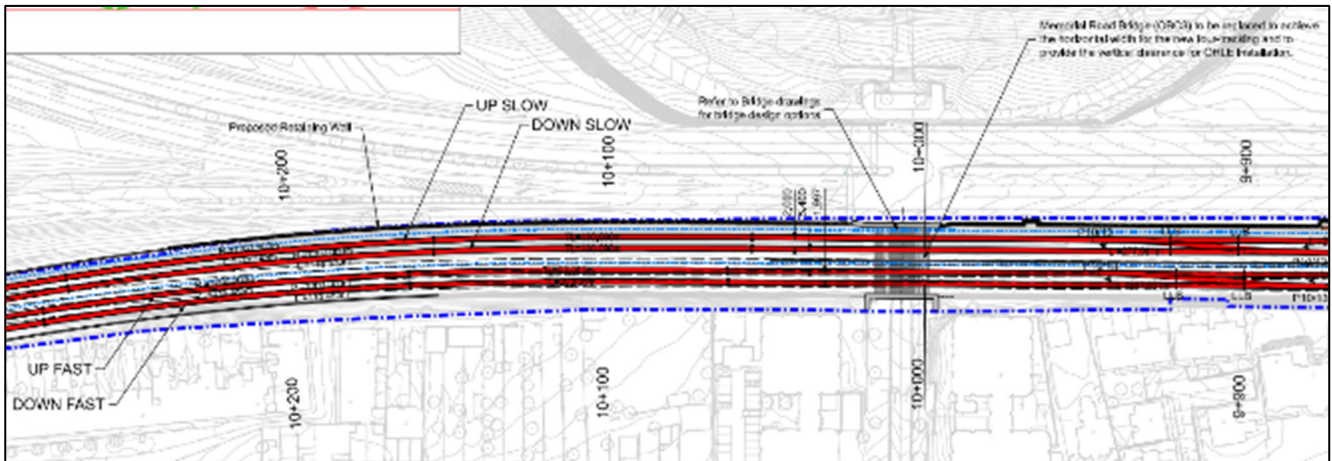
Memorial Road Bridge (OBC3) – Track Plan Layout
